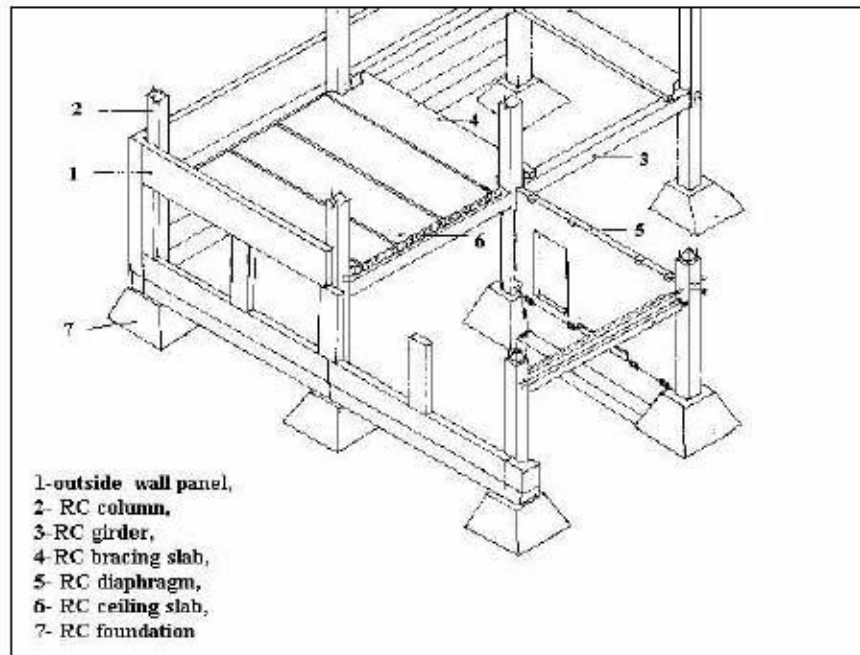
Components of a precast reinforced concrete frame system of Seria IIS-04 (WHE Report 66, Uzbekistan)
